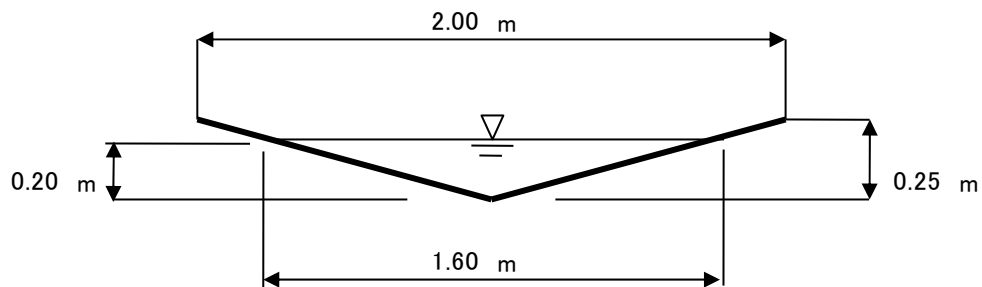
Proposed Concrete Lined Ditch for Cutting Section
